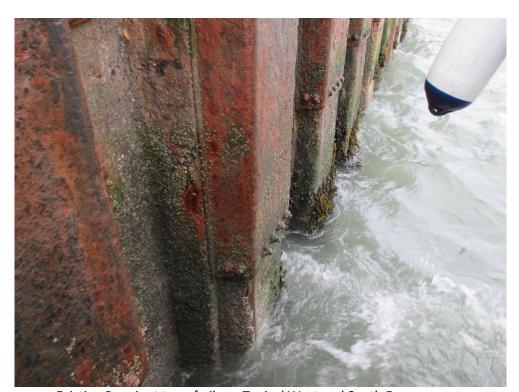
Existing Repair at top of piles – Typical West and South Faces
